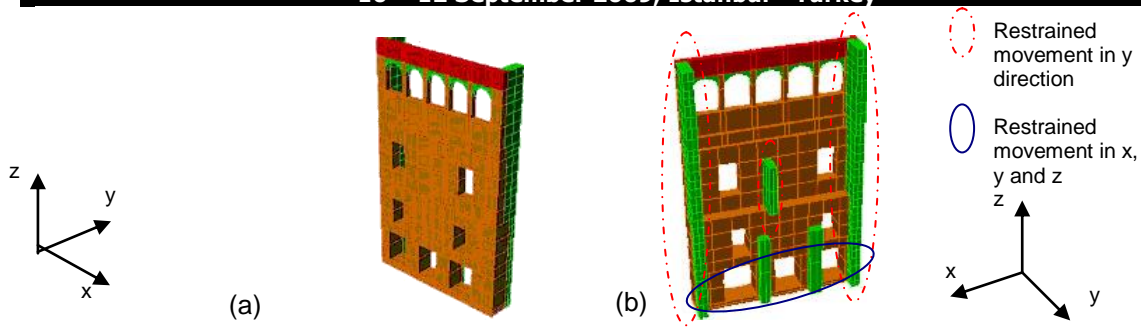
Palace façade geometric model: (a) Front; (b) Back.
